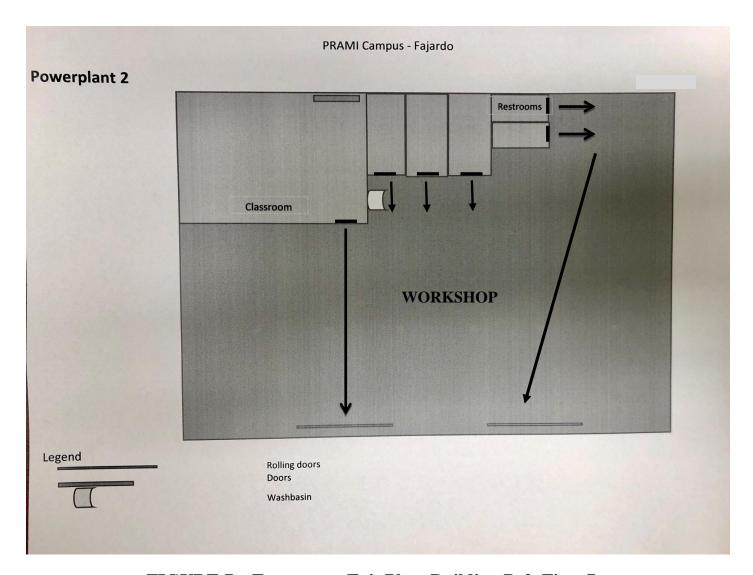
Emergency Exit Plan, Building D-2, First floor Powerplant Classroom (D - 102)
